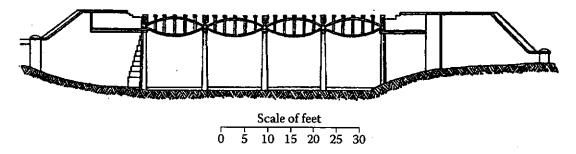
Stockton & Darlington Railway Bridge 1823.
